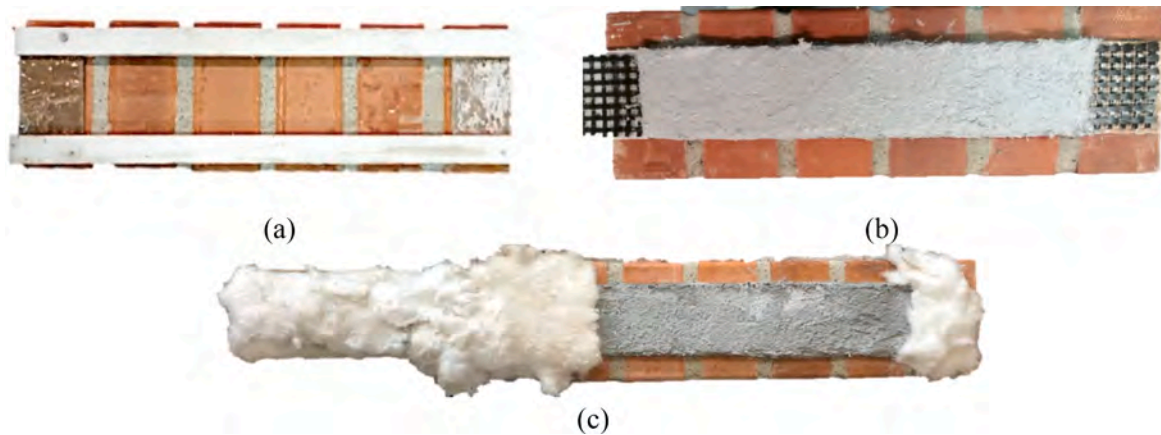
Manufacturing steps: (a) Teflon formwork; specimen (b) after curing at laboratory conditions, and (c) before the thermal preconditioning.
